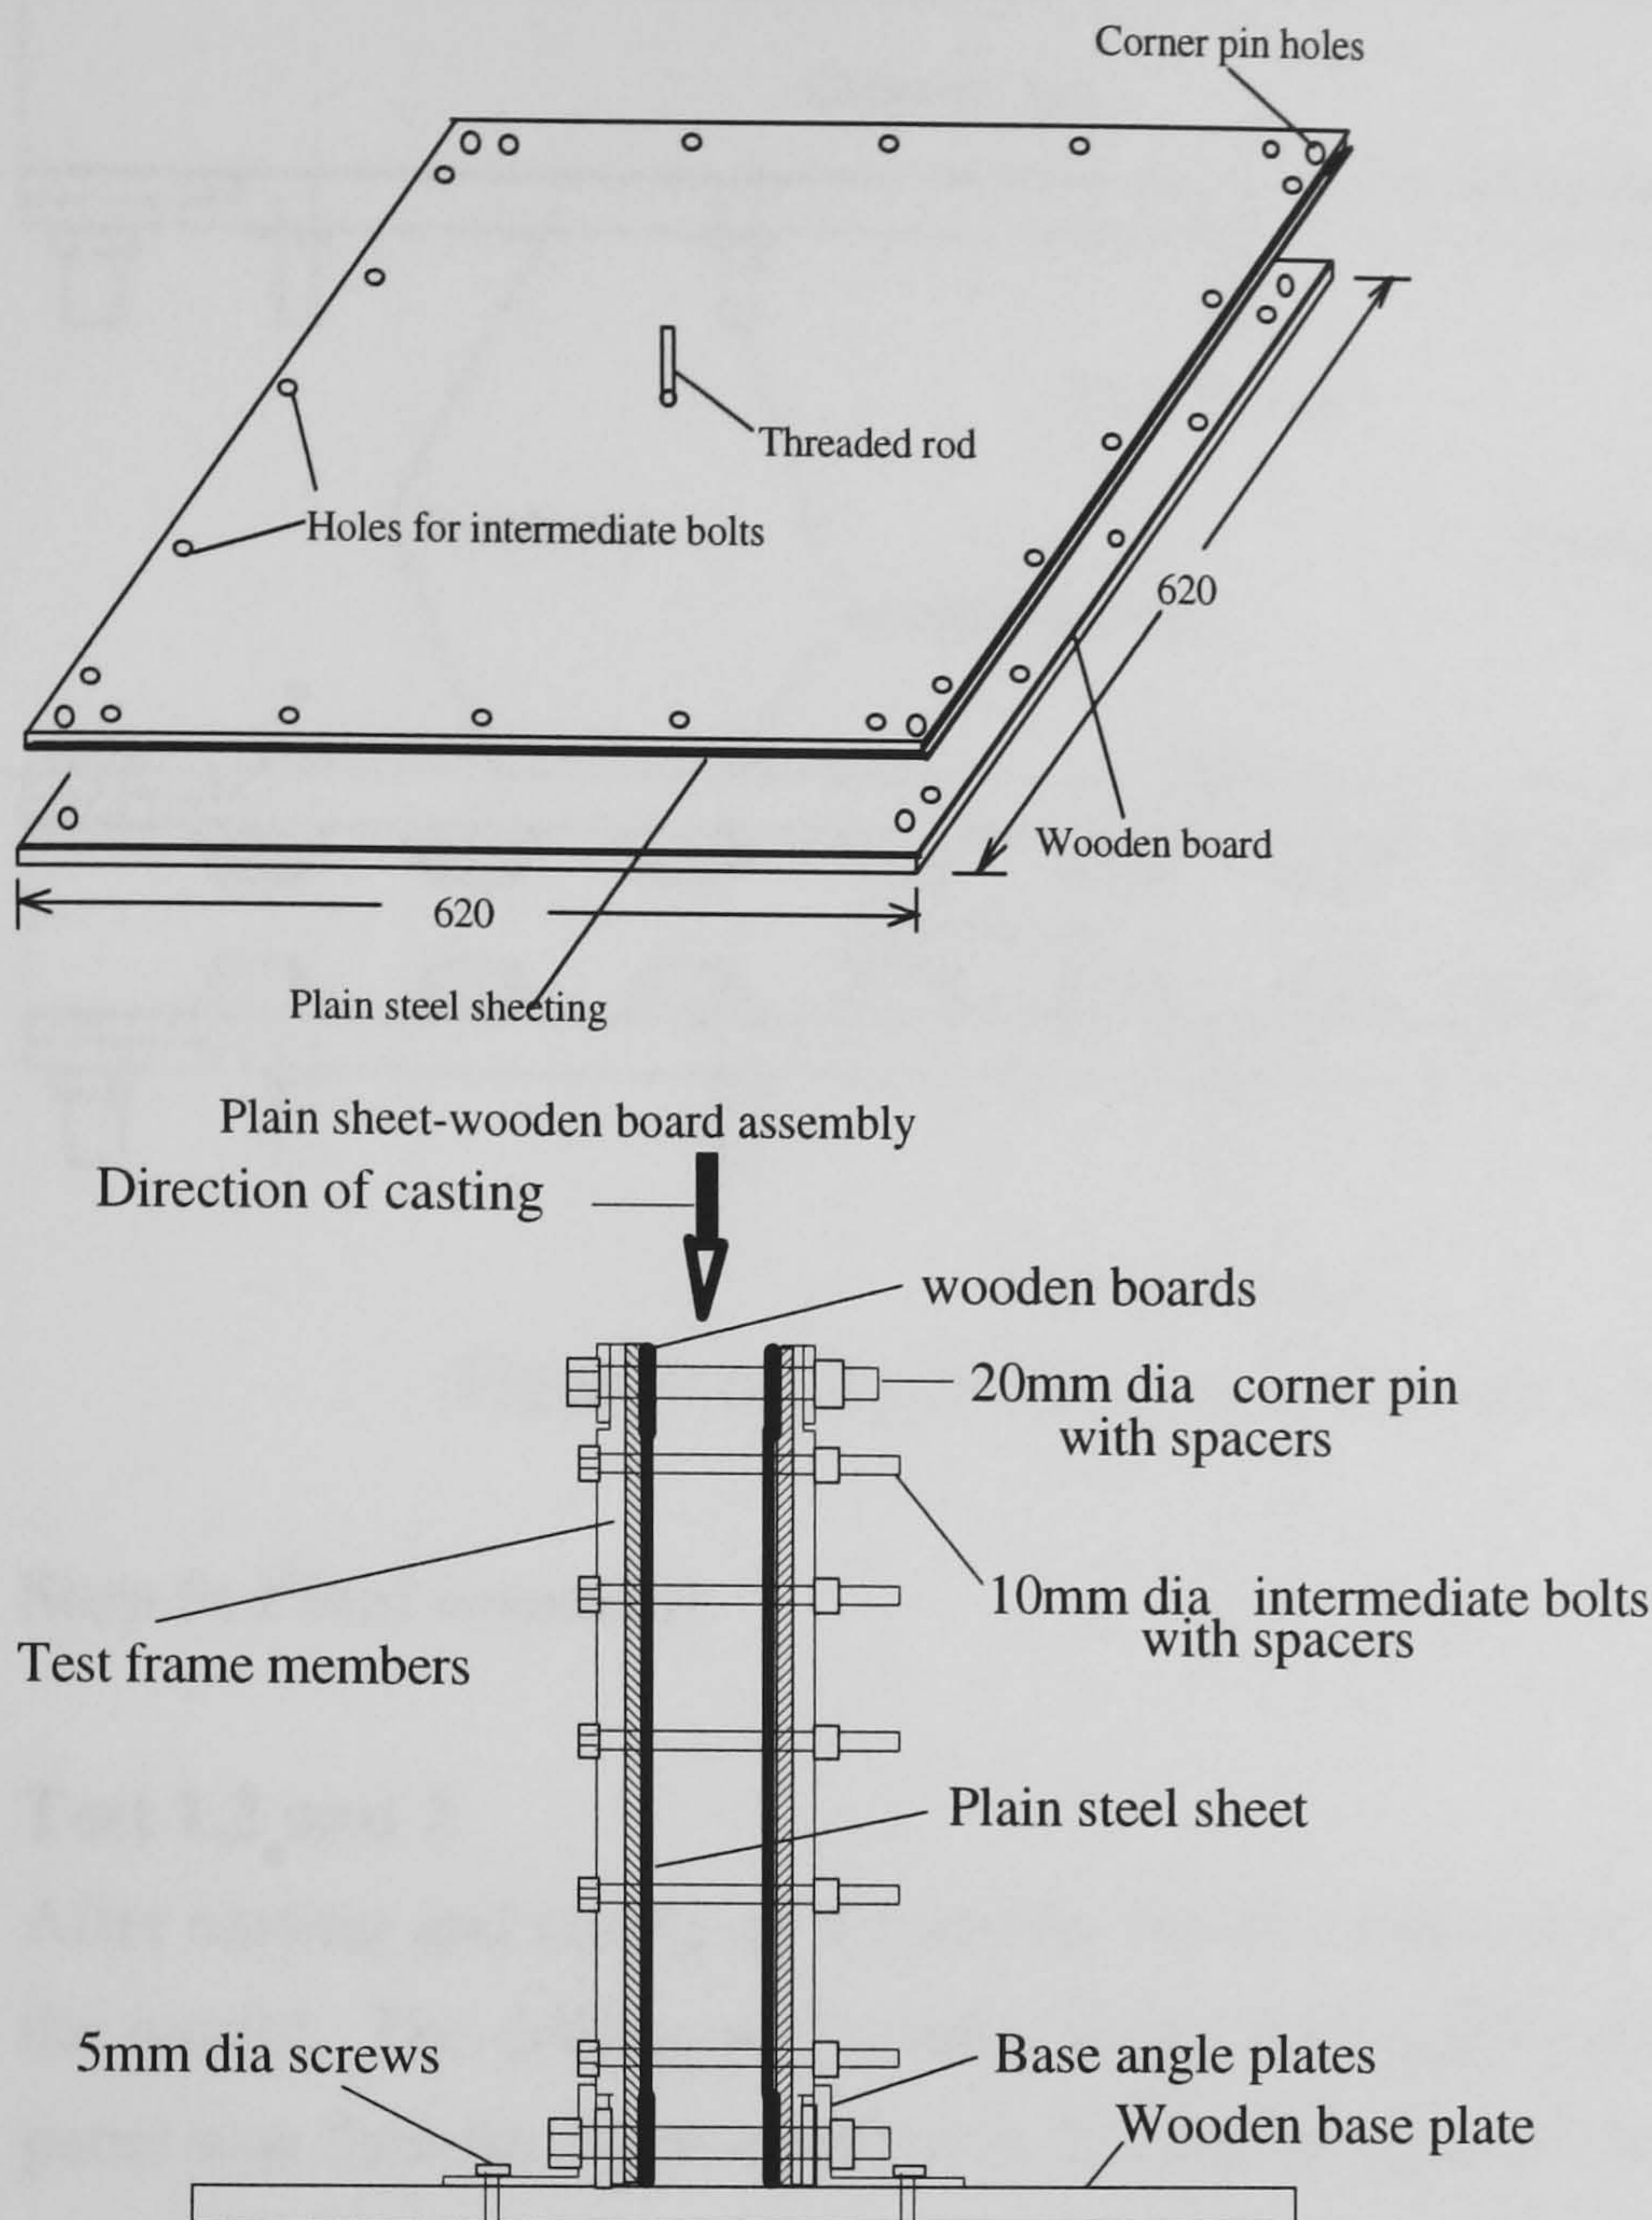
Complete mould with plain sheet-wooden board assembly
